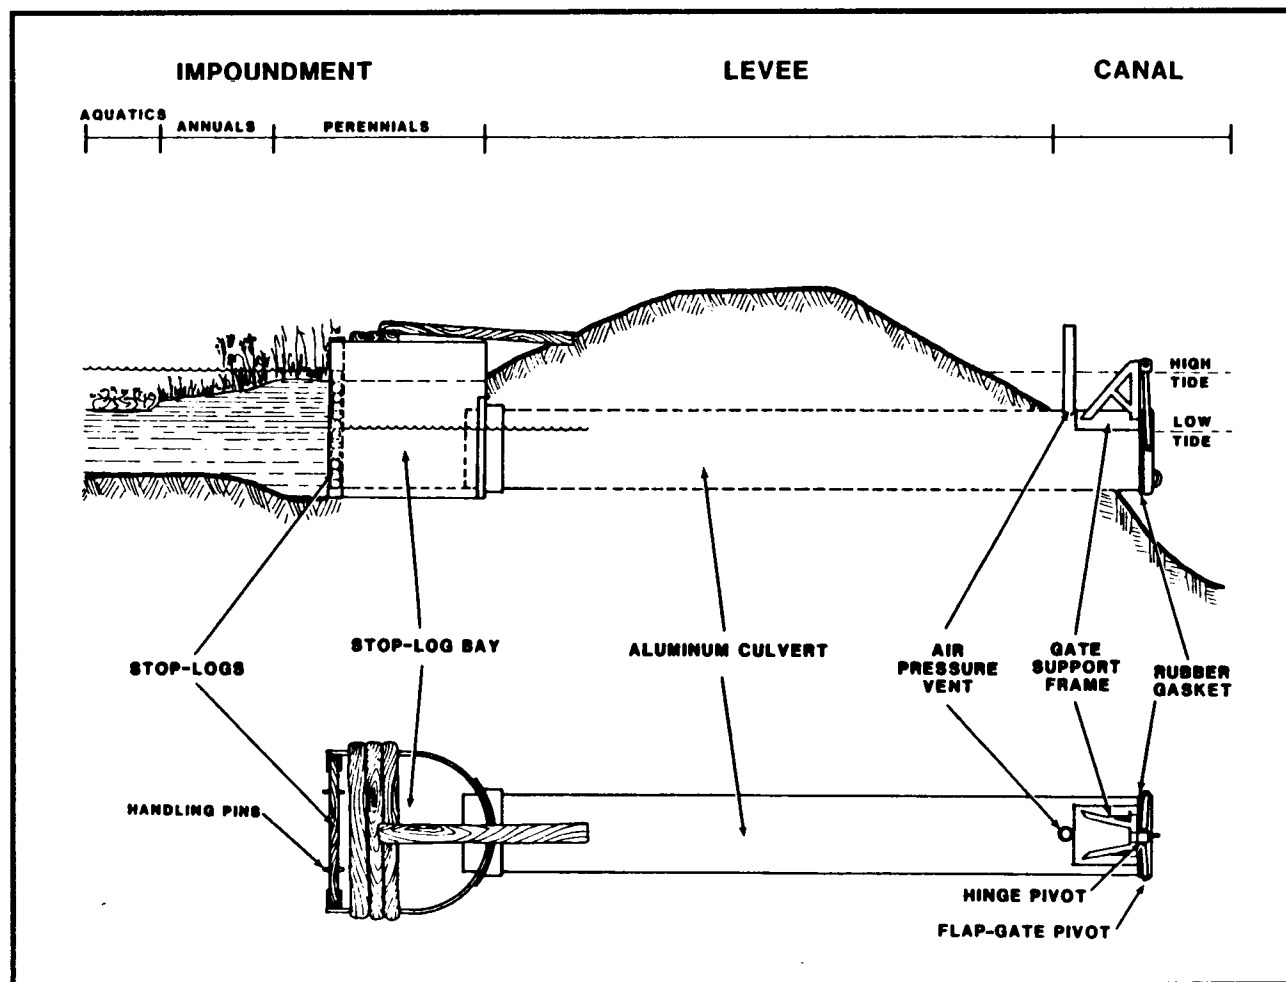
Single flap-gated culvert with variable-crest weir (Wicker et al. 1983). NOTE: conceptual drawing; not to be used for design.
